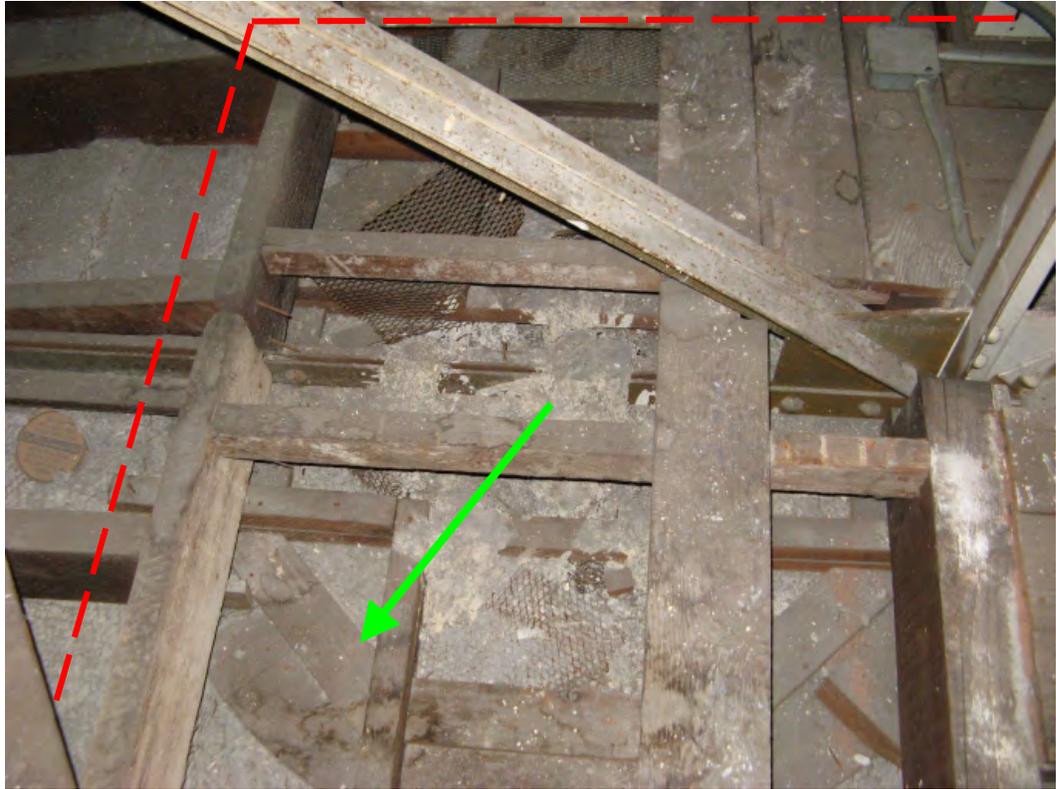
Wooden armature of rosette (green arrow), north east corner of north west laylight. Cut should be made at least 4 inches from the edge of the armature (red line).
